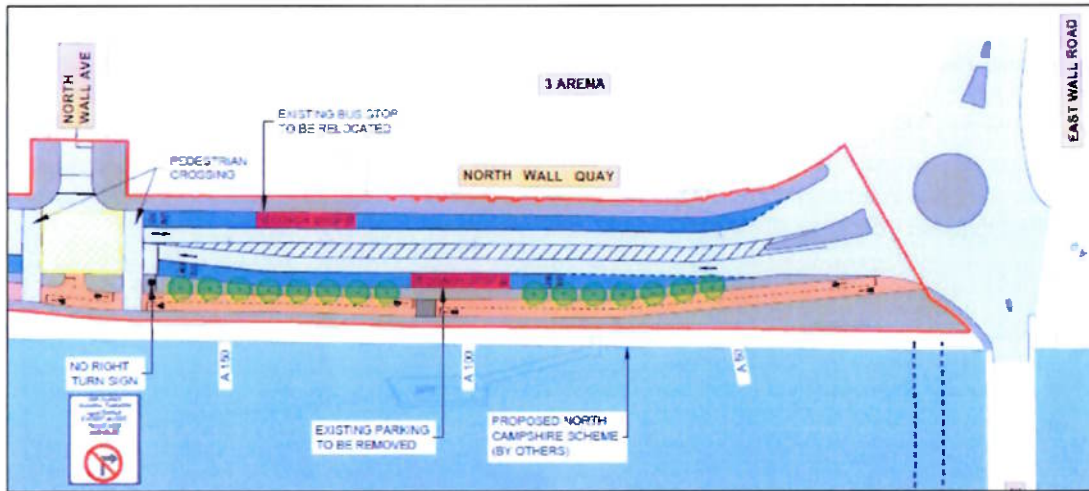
Extract from General Arrangement Drawing Sheet 5 North
